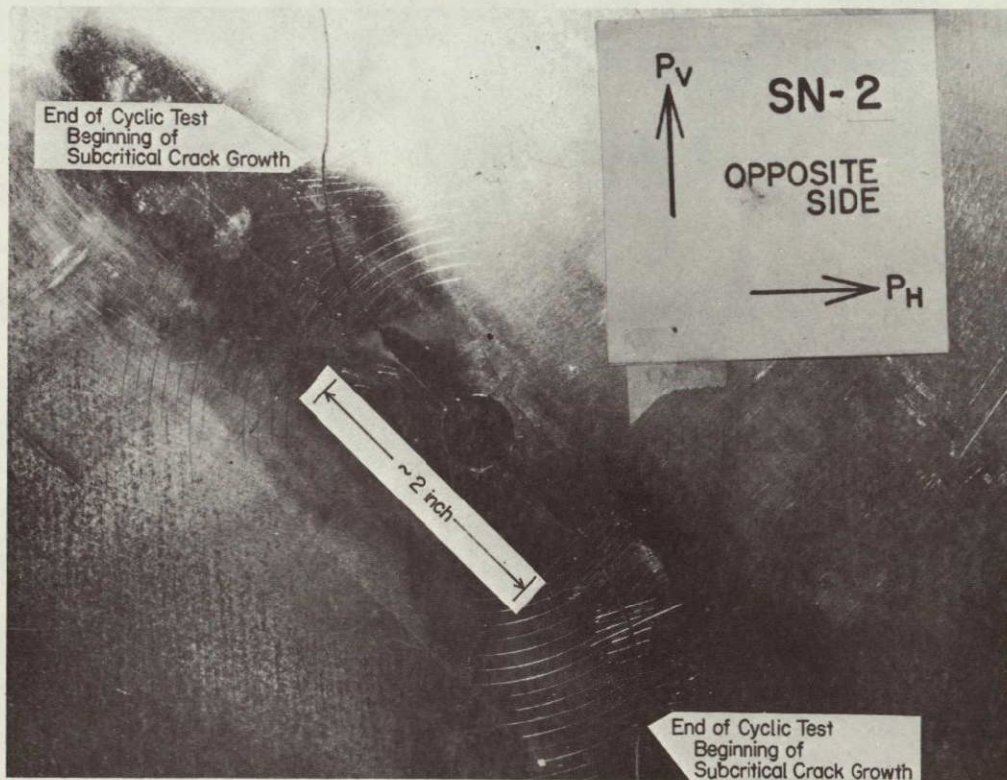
Closeup View of SN-2 after Fracture, Opposite Side.
